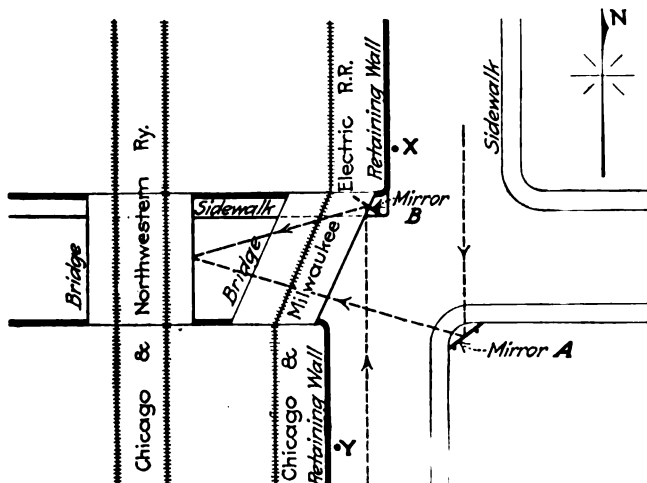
PLAN OF ROAD CROSSING FITTED WITH MIRRORS, GLENCOE, ILL.
